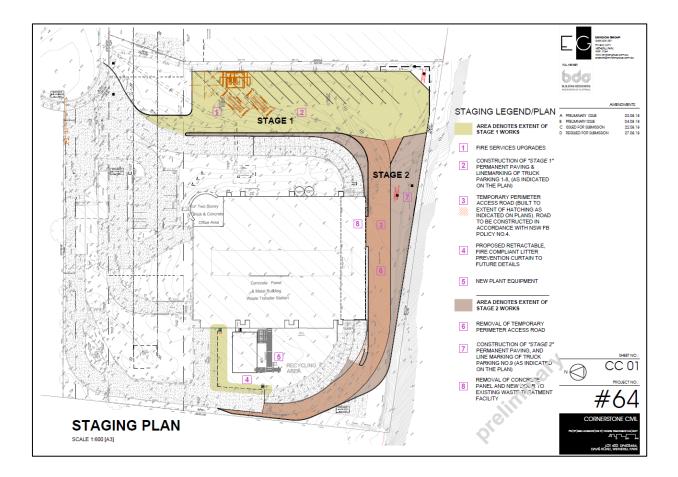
Staging Plan of Wetherill Park Resource Recovery Facility
